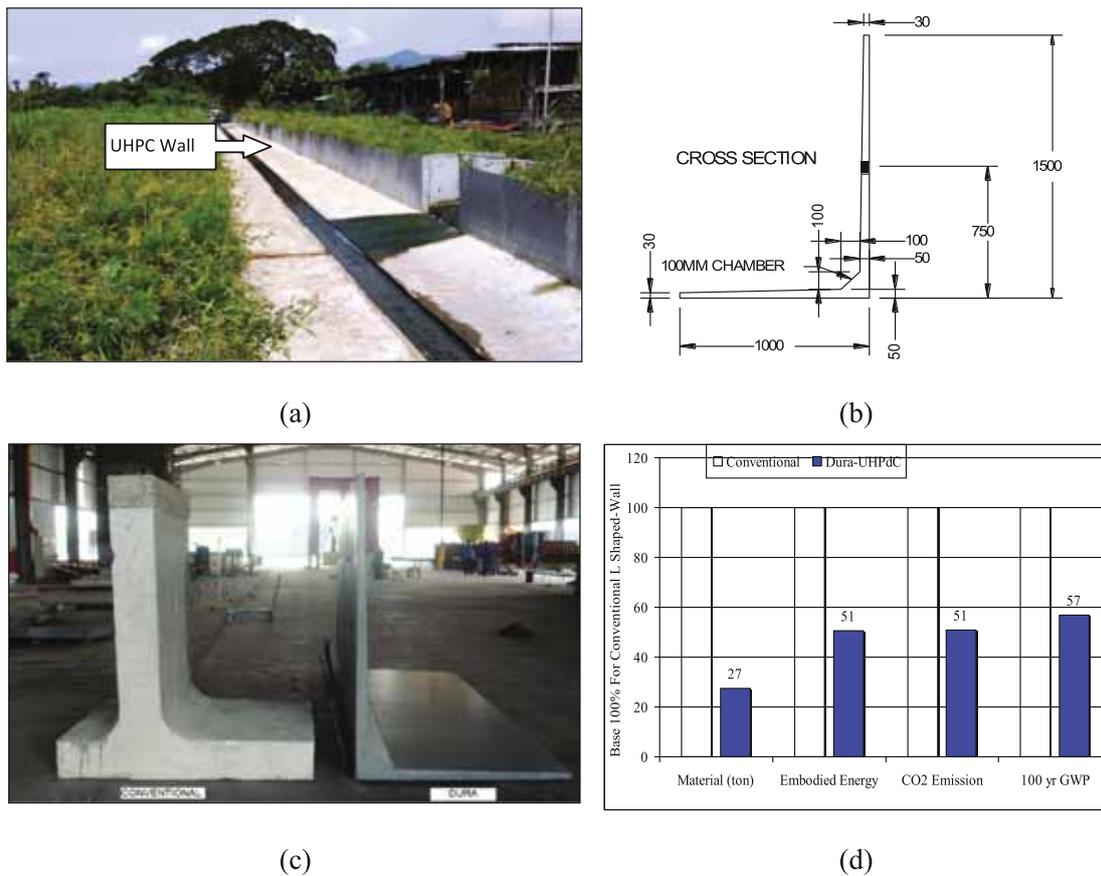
(a) shows a 180 m long by 1.5 m high L-shape retaining wall that was used in the construction of a 90 m long monsoon drain for a housing development project in Ipoh, Perak. The L-shaped wall comes with thin panels of 30–50 mm thick (see Fig. 12(b)). Unlike conventional RC L-shaped precast walls, which weight 1200 kg per lineal metre, and are provided in one metre lengths, the UHPC retaining wall is made in 3 m lengths per piece (Fig. 12(c)) and have a self-weight of just 260 kg per lineal metre of wall; that is a factor of five times lighter than the conventional solution. Prior-to construction of the wall, the local council requested a load proof test of the wall panel to meet a service surcharge loading of 10 kPa, and a 15 kPa surcharge at ultimate. The wall was tested with back filled soil up to 1.5 m and an additional surcharge load of 25 kPa; that is, 66% greater than the strength limit requirement and still it did not fail! Thus, the wall performance was demonstrated to satisfy both design service and strength requirements.
